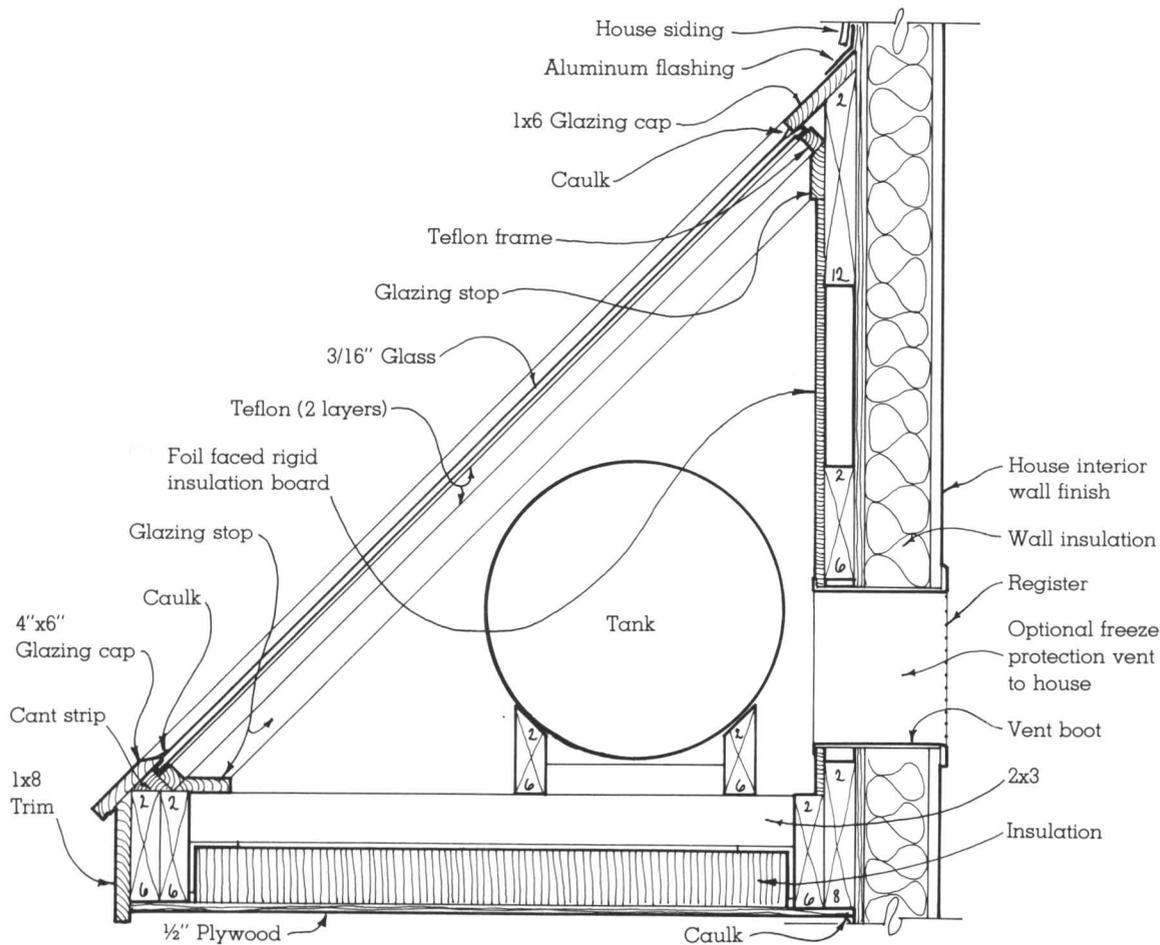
Side view of wall-mounted batch water heater. *Note:* Locate the tank approximately 1 1/2" from the inner glazing.
